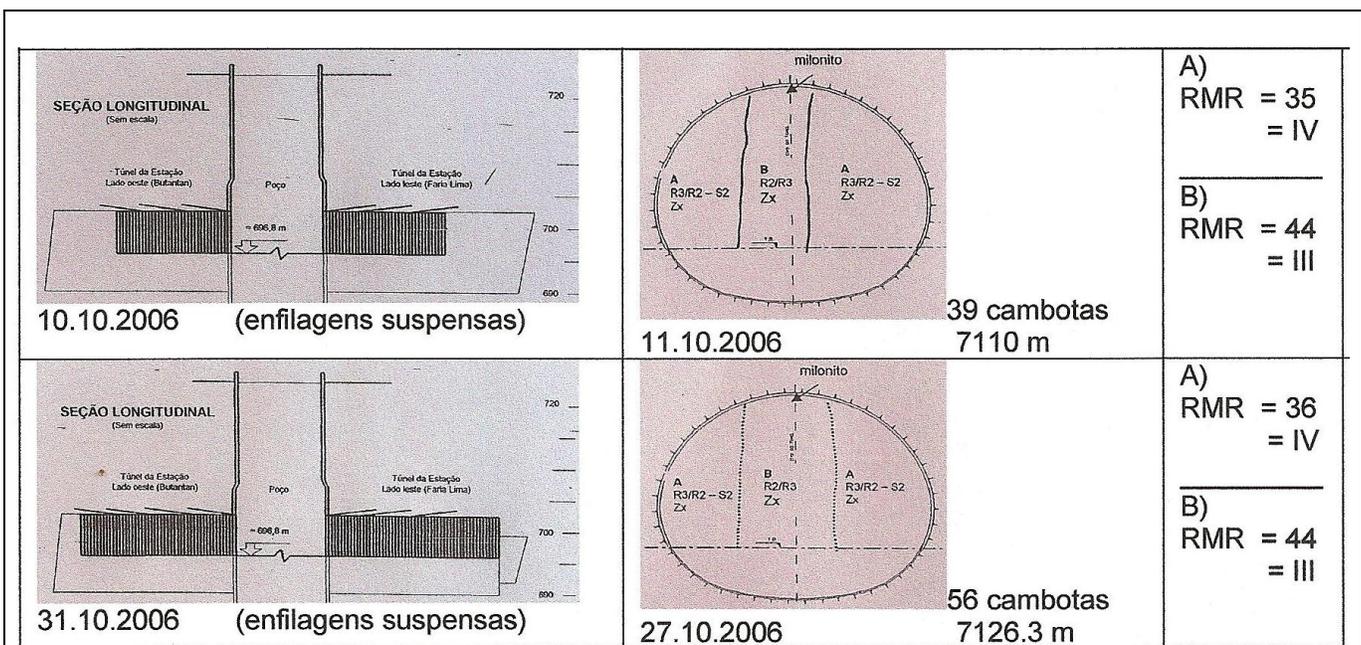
Longitudinal sections showing progressing number of lattice girders at two of the mapped cavern faces. The RMR rock class values of the ‘core’ (B) and the surrounding rock (A) are listed. Pre-injection screens (enfilagens) were suspended after #3 due to improving rock quality and reduced grout take towards the eastern end of the cavern under Rua Capri.
